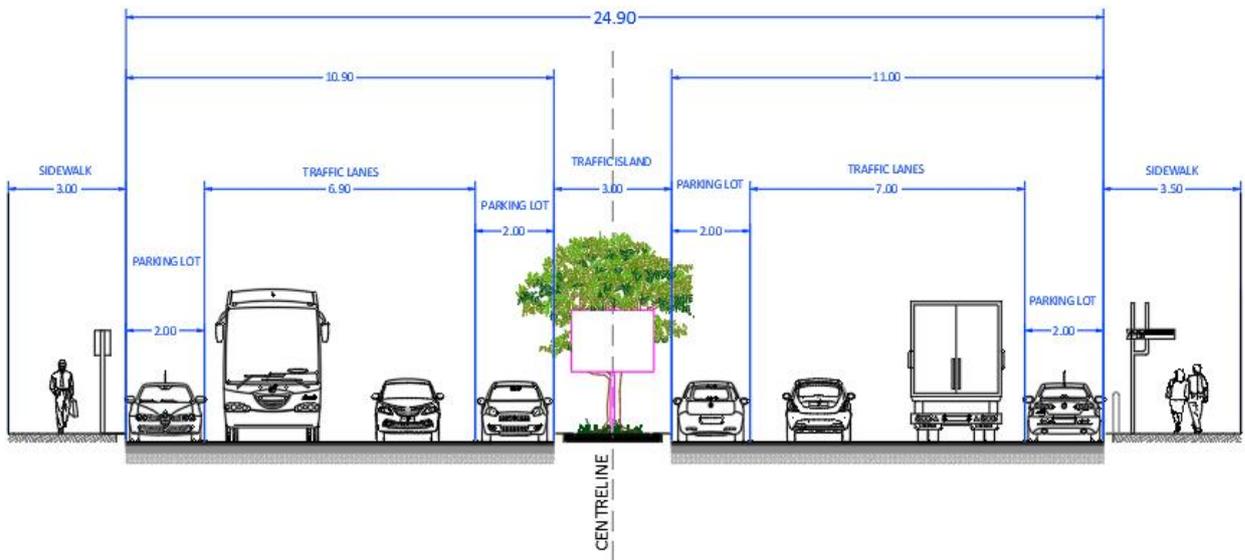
Cross section, section F-F'; road segment of Viale Papa Giovanni XXIII.
